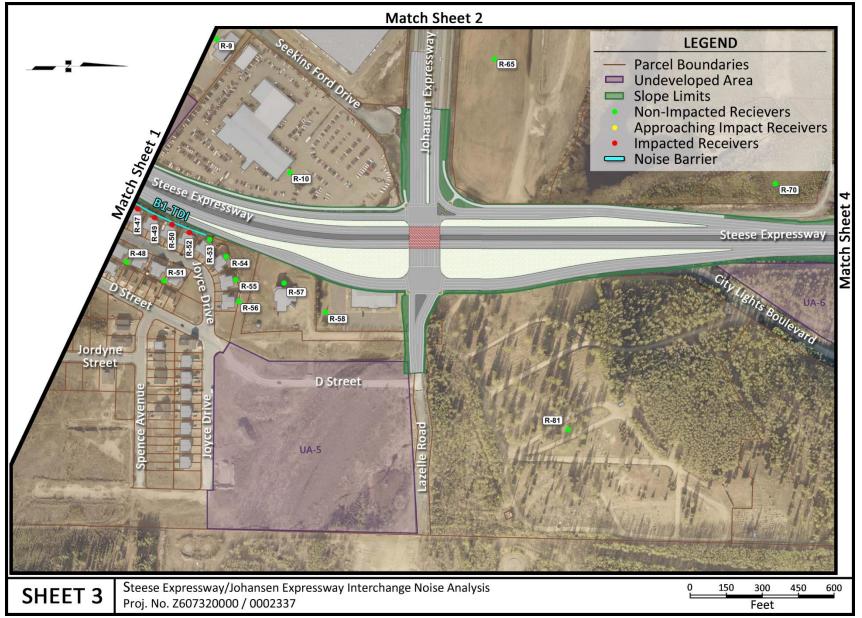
Tight Diamond Interchange Noise Impacts and Proposed Barrier Walls, Sheet 3
